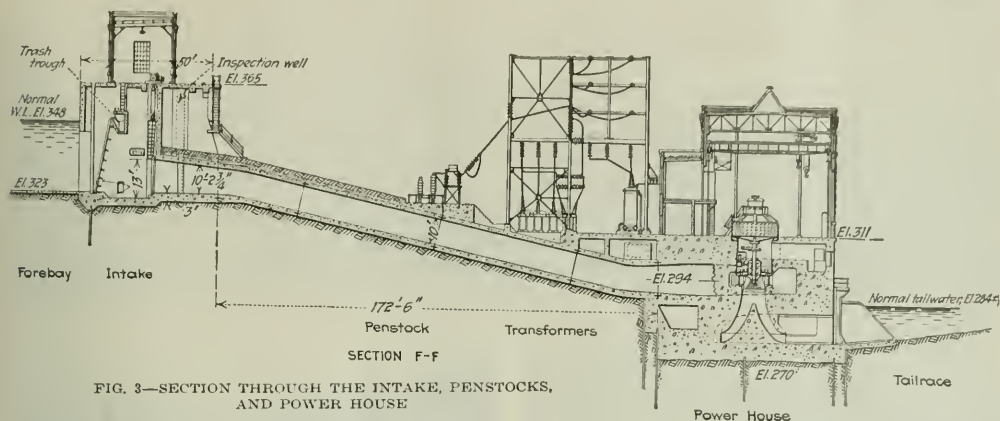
SECTION THROUGH THE INTAKE, PENSTOCKS, AND POWER HOUSE
